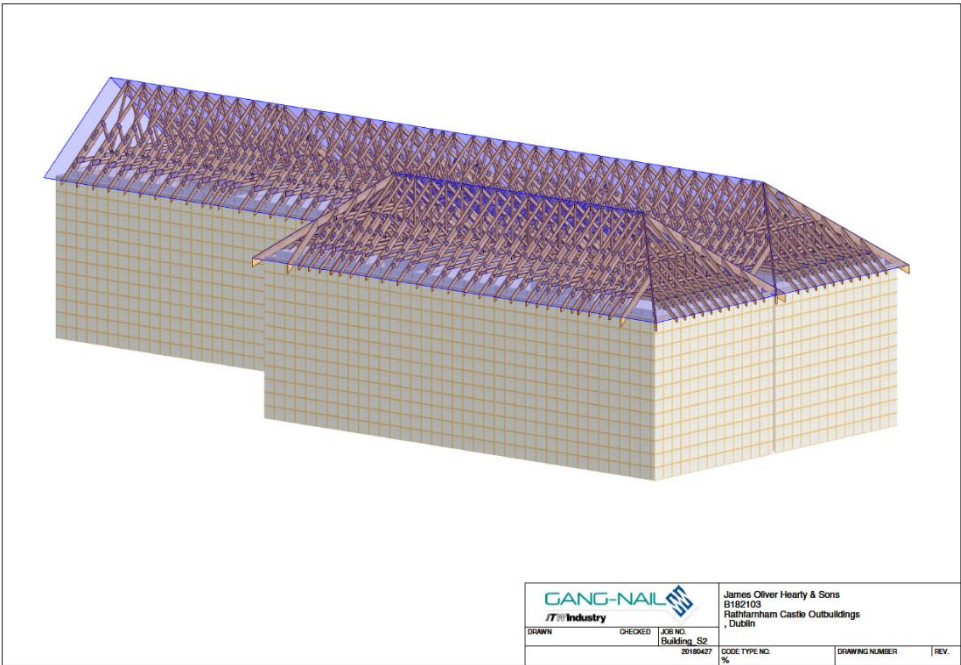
Isometric of Building B2 roof c/o fabrication set of drawings from JOH & Sons Contractors for 2017/2018 works
